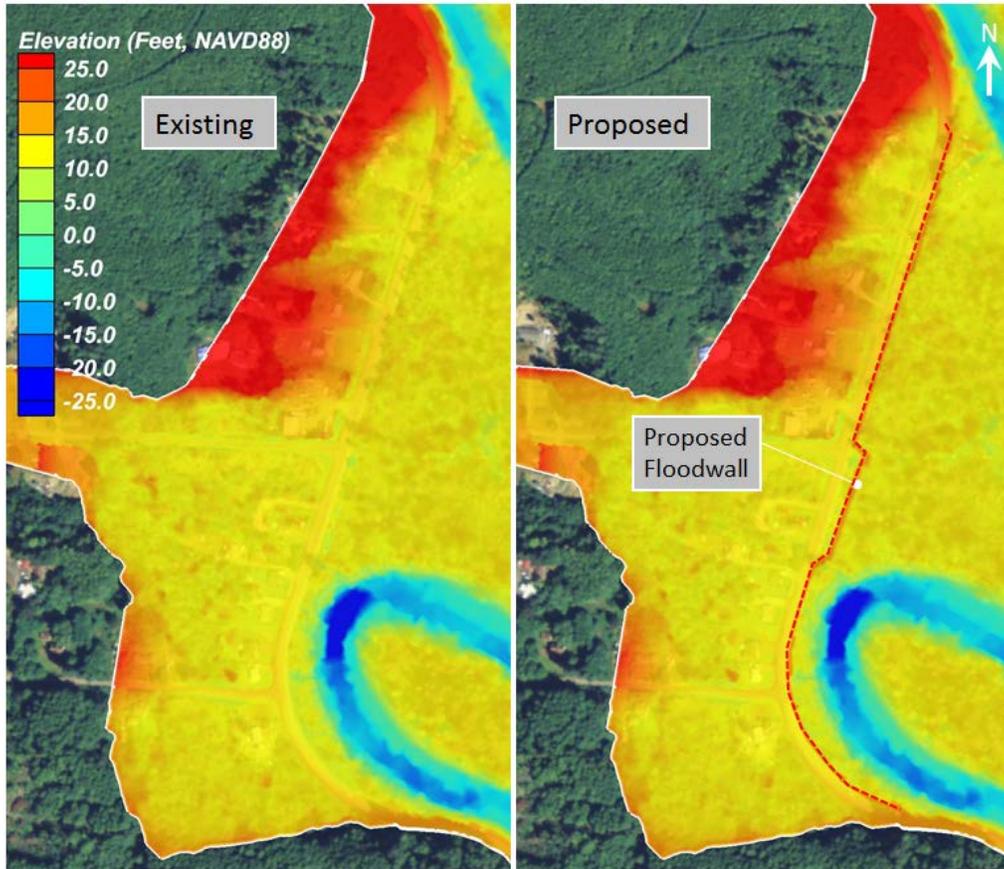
The elevation model of existing conditions and parameterization of flood wall (dashed red line) in elevation model for proposed conditions
